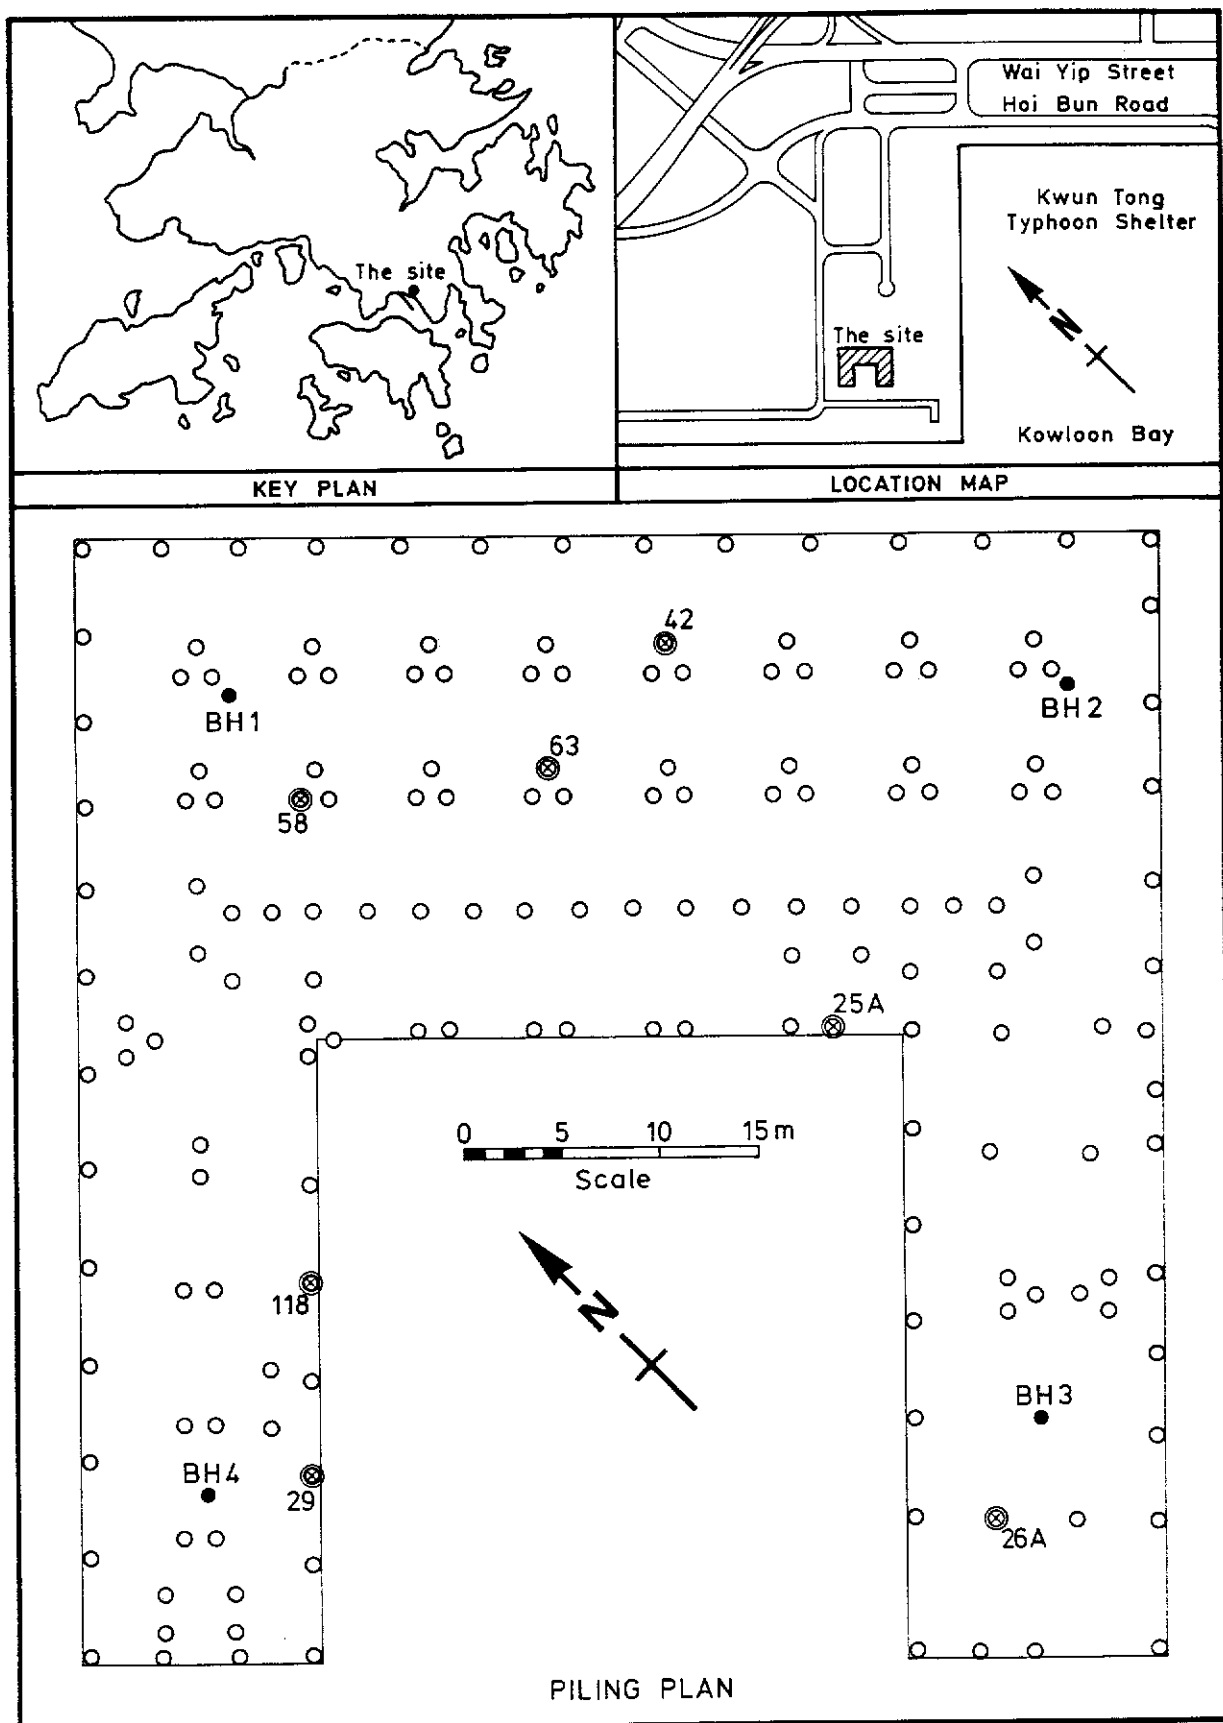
Piling Plan of the New Public Works Central Laboratory Showing Locations of Instrumented Piles and Boreholes
